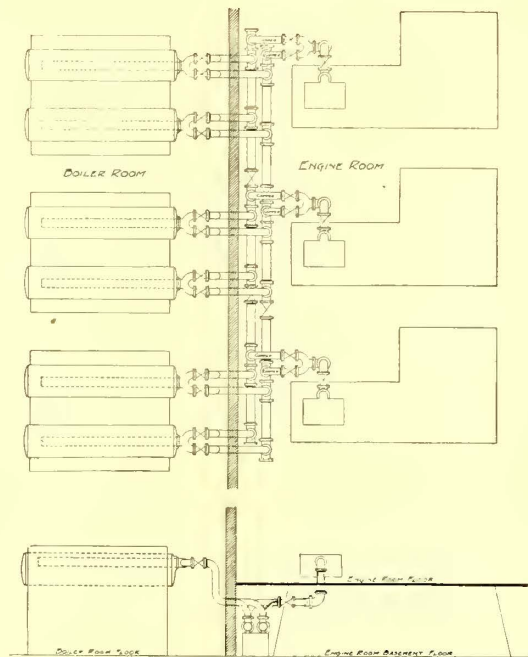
DUPLICATE PIPING WITH EQUAL SIZED MAINS IN CONSTANT USE—PLAN AND ELEVATION.
